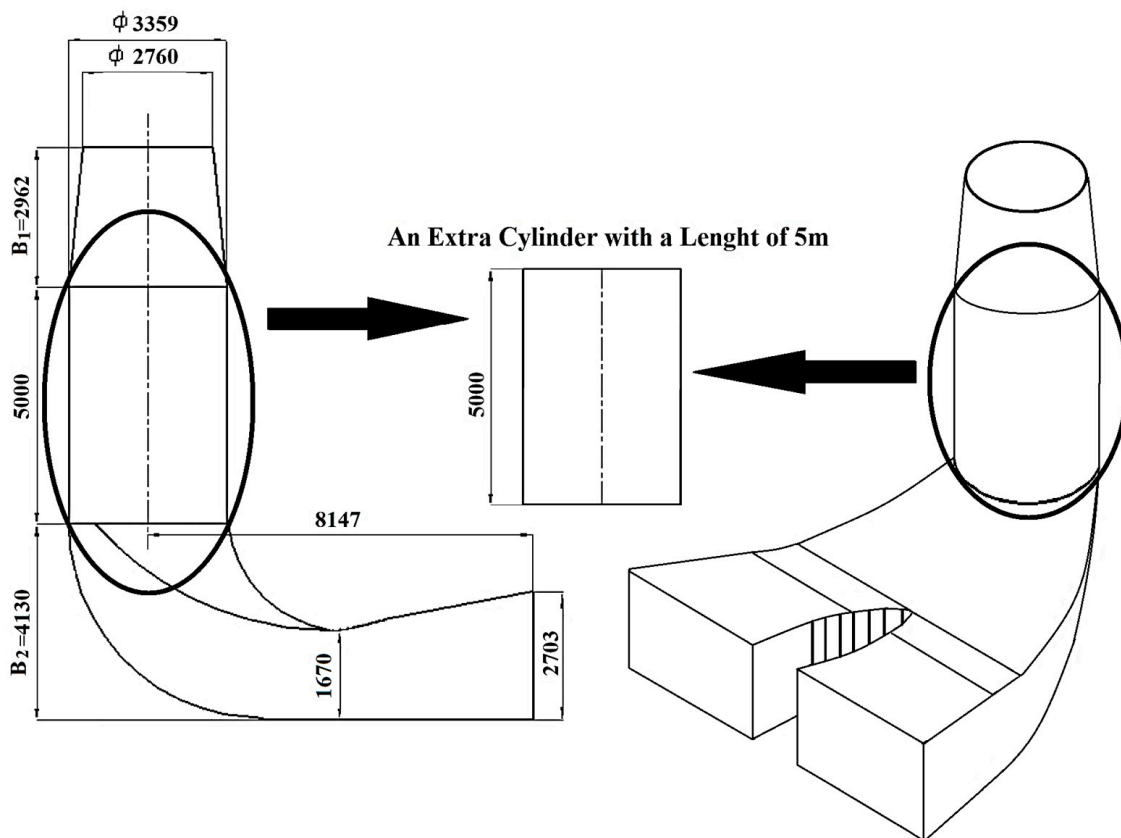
Maroon draft tube as-built dimensions (in millimeters).
